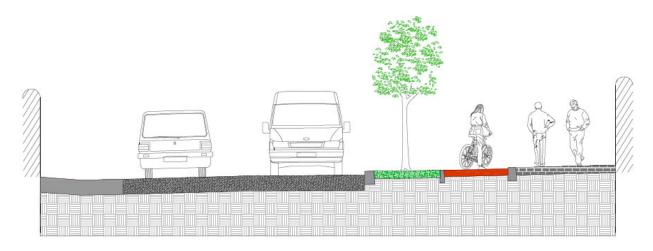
Typical Proposed Cross Section – Existing N2 South (Section at Ch. 850)
